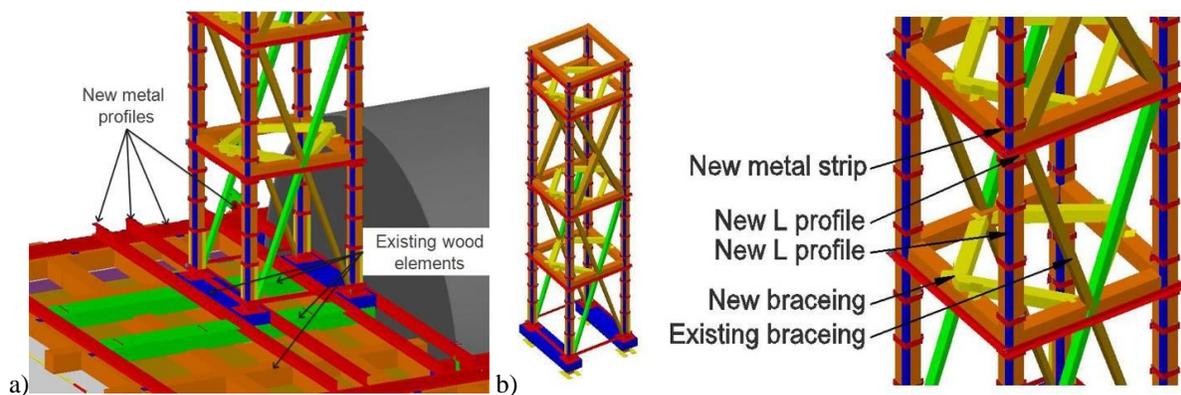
a), b) Consolidation solutions for the wooden columns and beams of the tower of the church
